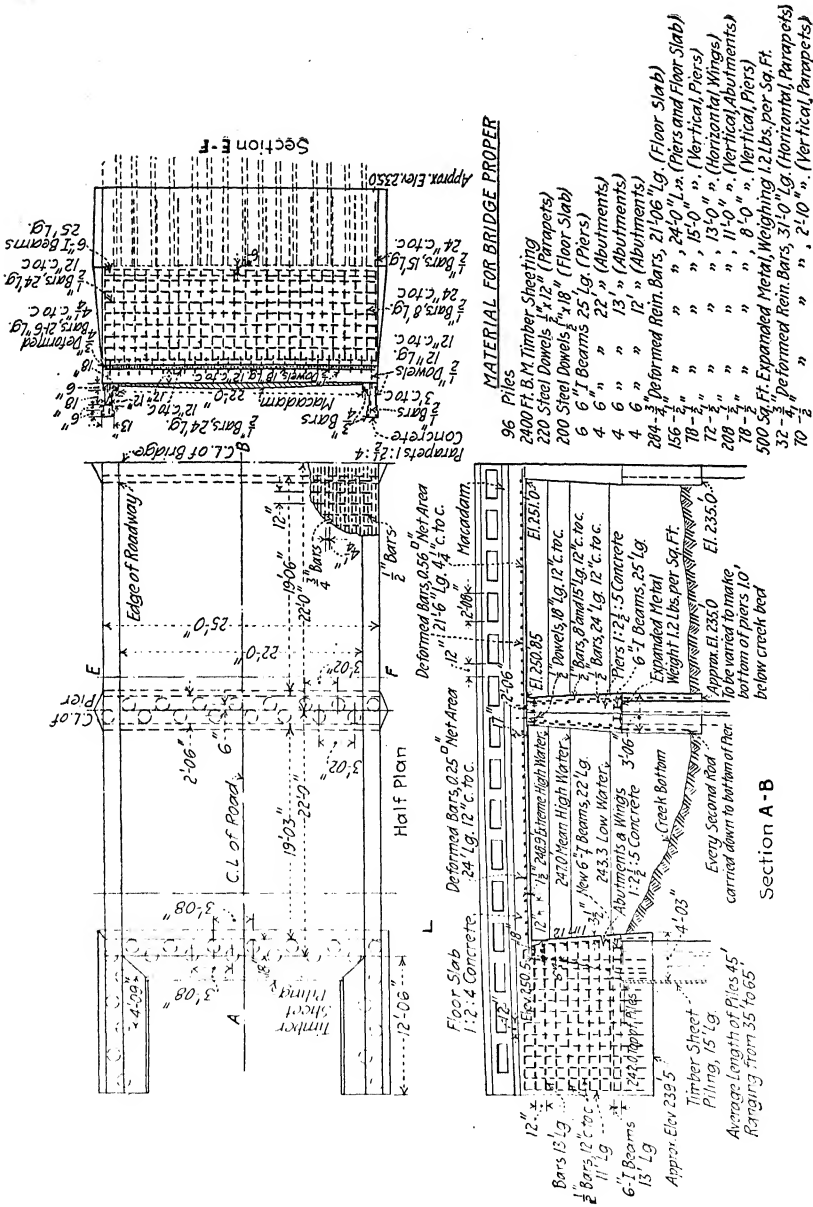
Typical reinforced concrete slab. Bridge on soft foundation.
